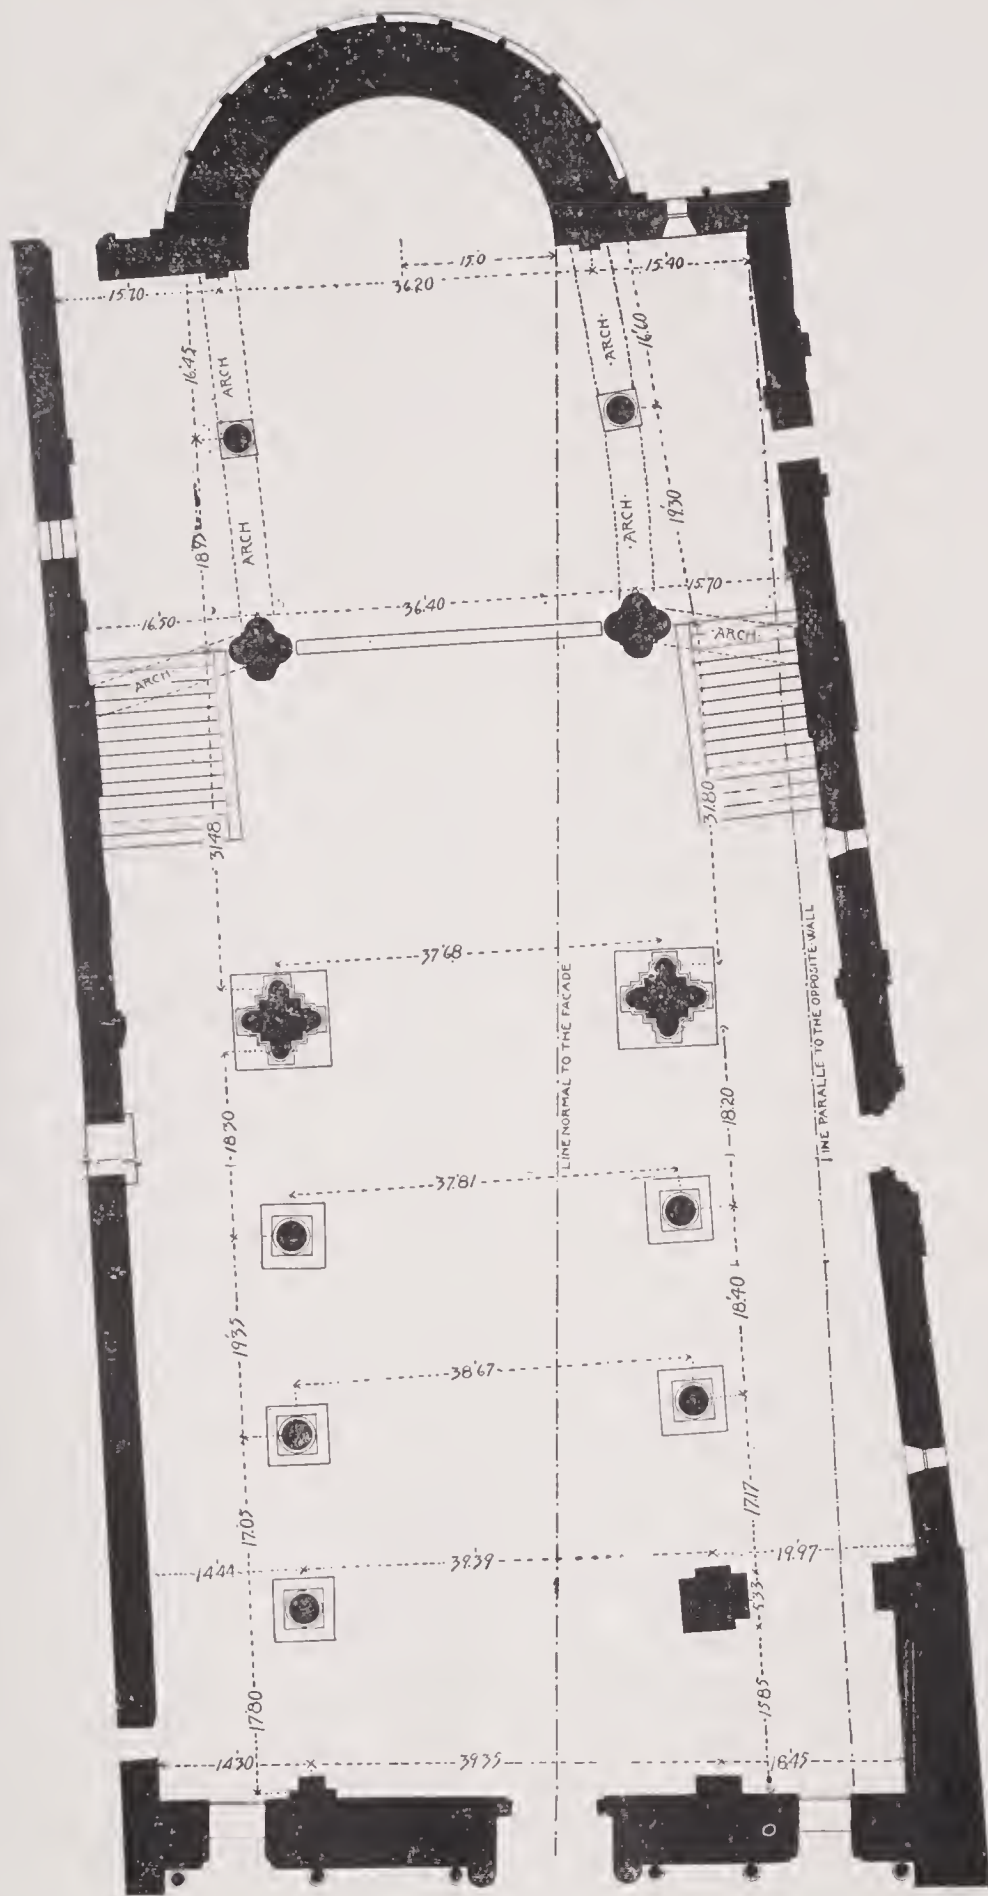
GROUND-PLAN OF SANTA MARIA DELLA PIEVE AT ARREZZO.
